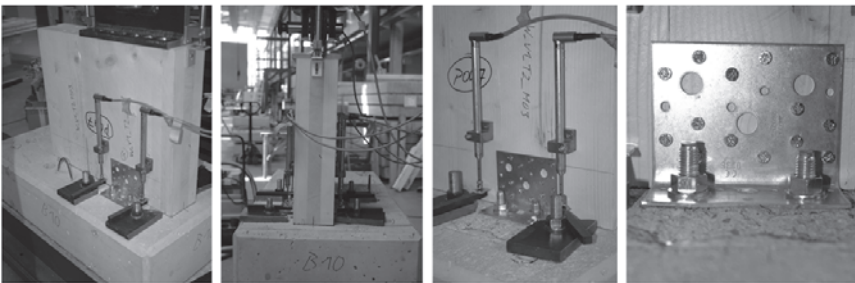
test configuration applied for tension (uplift) loaded angle brackets in a wall-to-foundation joint (internal designation W_V1_T2)
